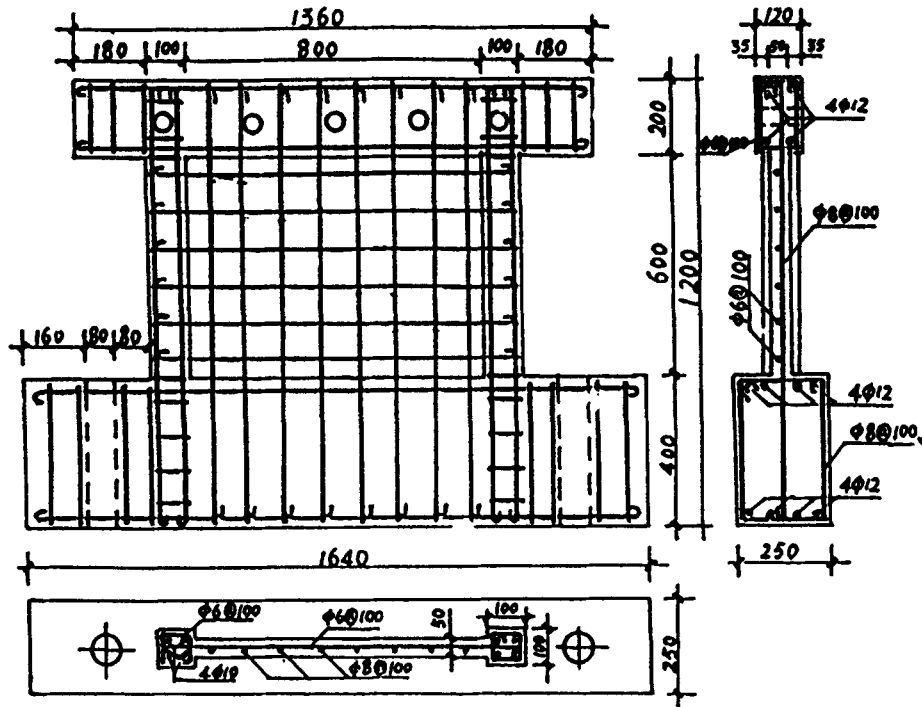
The detail of the tested specimen of low-rise shear walls (units = mm)
